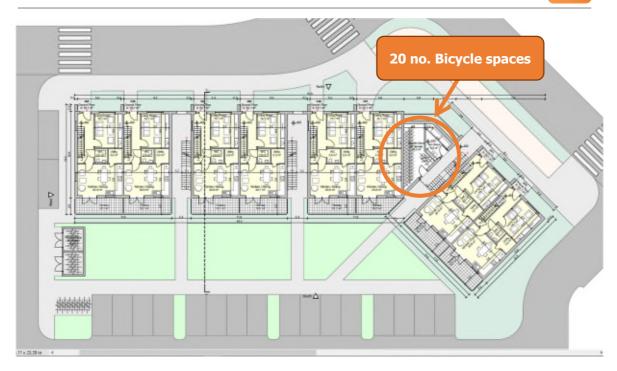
Block H Ground Floor Layout (Delphi Architects drawing no. D1408-19-PA14-CA3)
